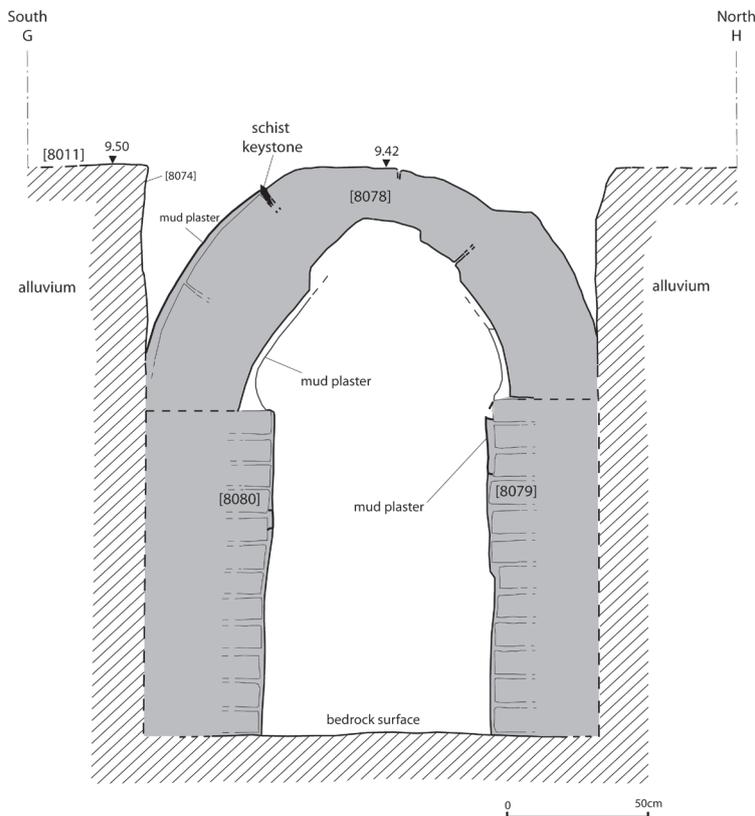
G101, north-south elevation of brick vault in central chamber.
